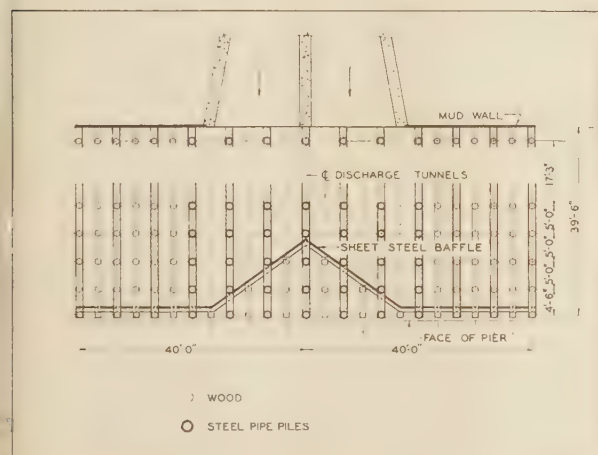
PRELIMINARY DESIGN OF OUTLET BAFFLE
